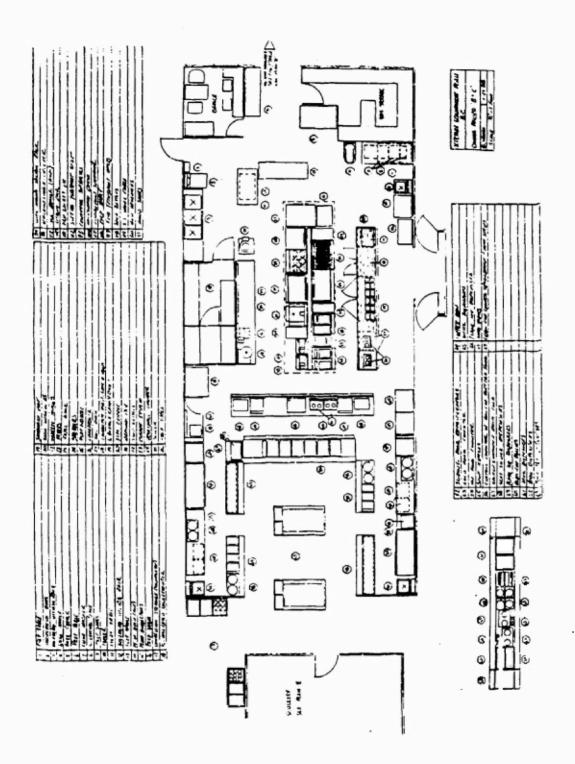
Dining Halls "B" and "C" Kitchen Equipment Plan.
